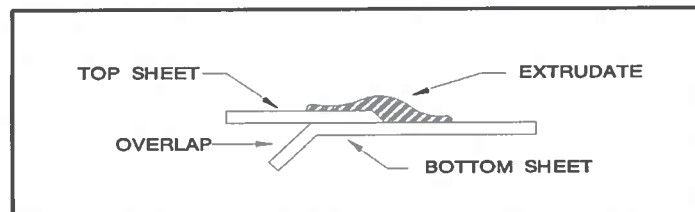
Fillet-Extruded Geomembrane Weld
